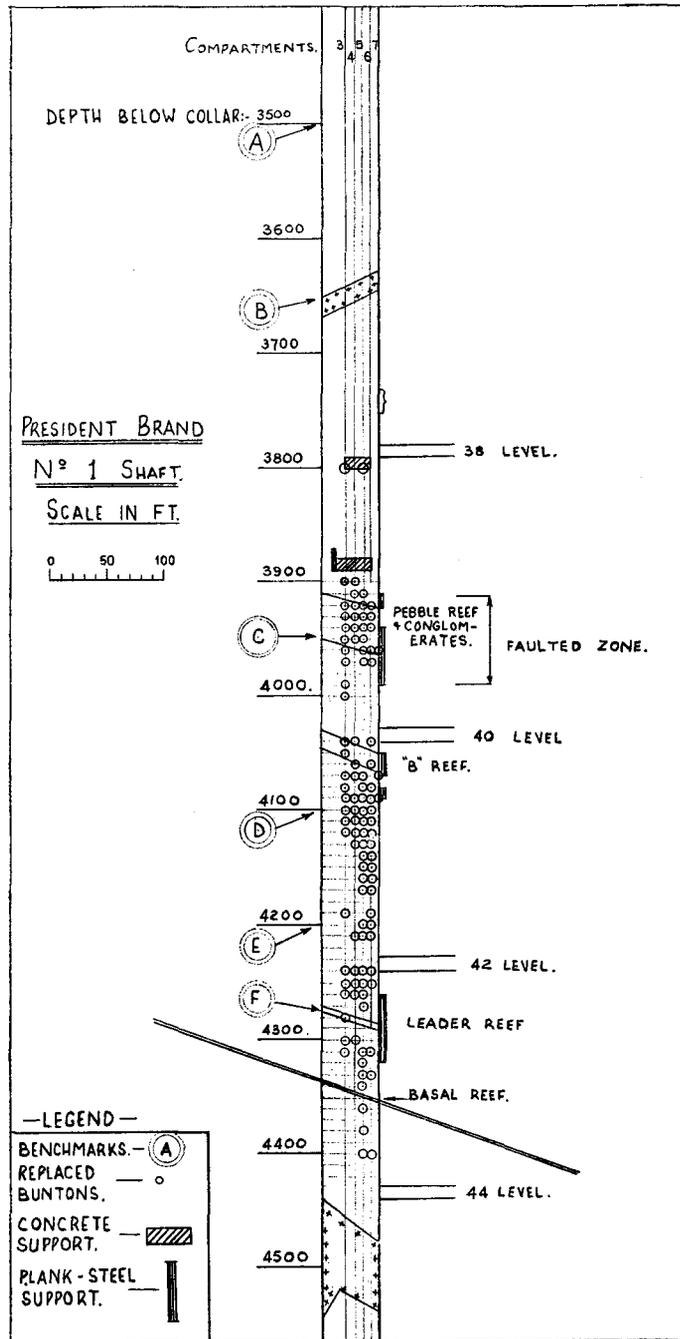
Section of President Brand No. 1 Shaft showing zones of damage
